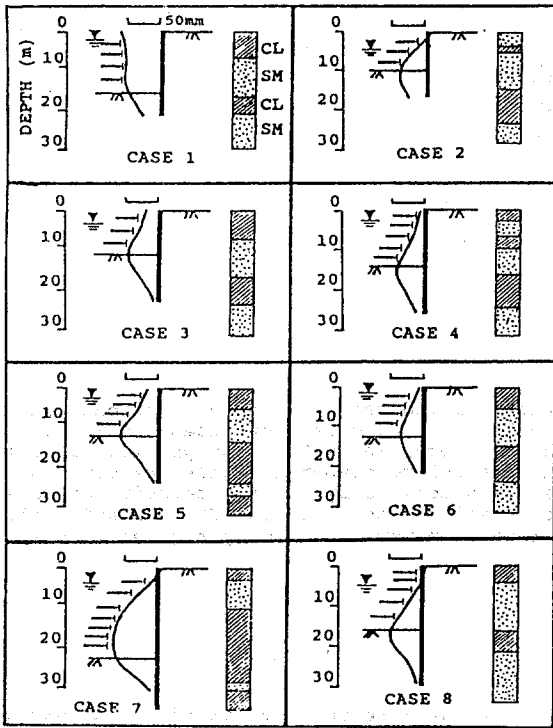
PROFILES OF EXCAVATION CASES AND LATERAL MOVEMENT OF DIAPHRAGM WALLS
